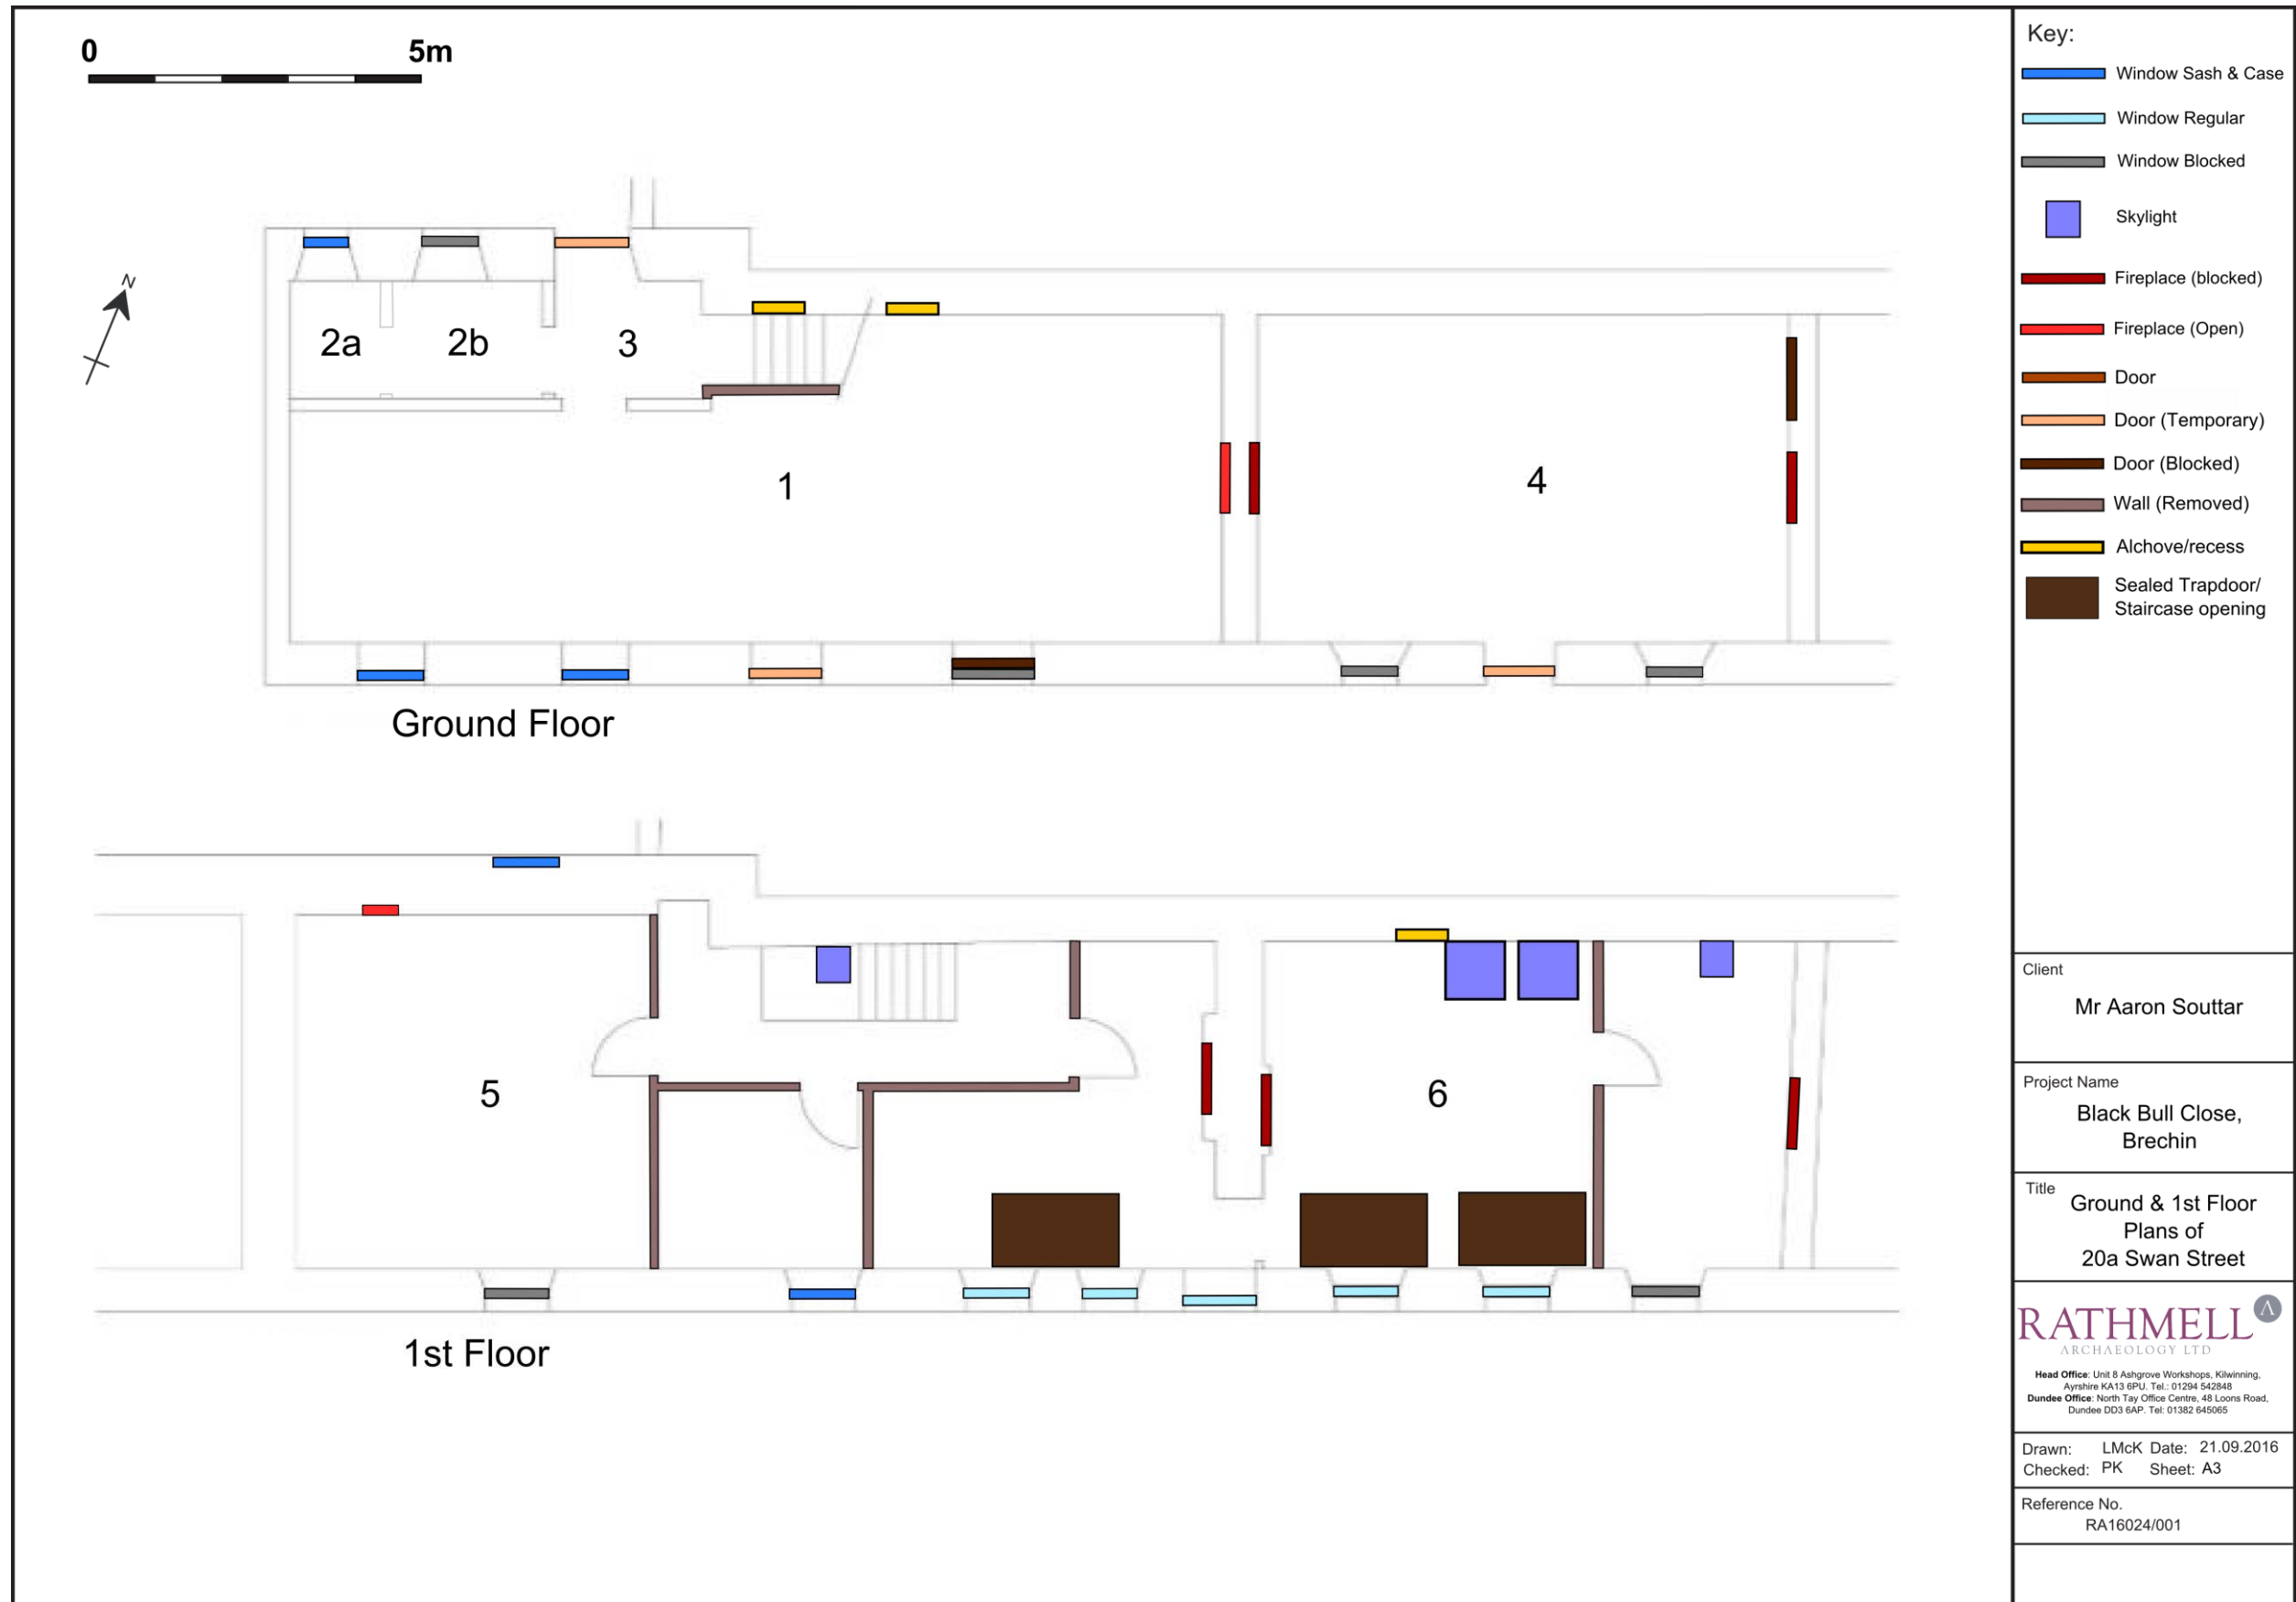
Plan of Ground and 1st Floors of 20a Swan Street (Store Room).
